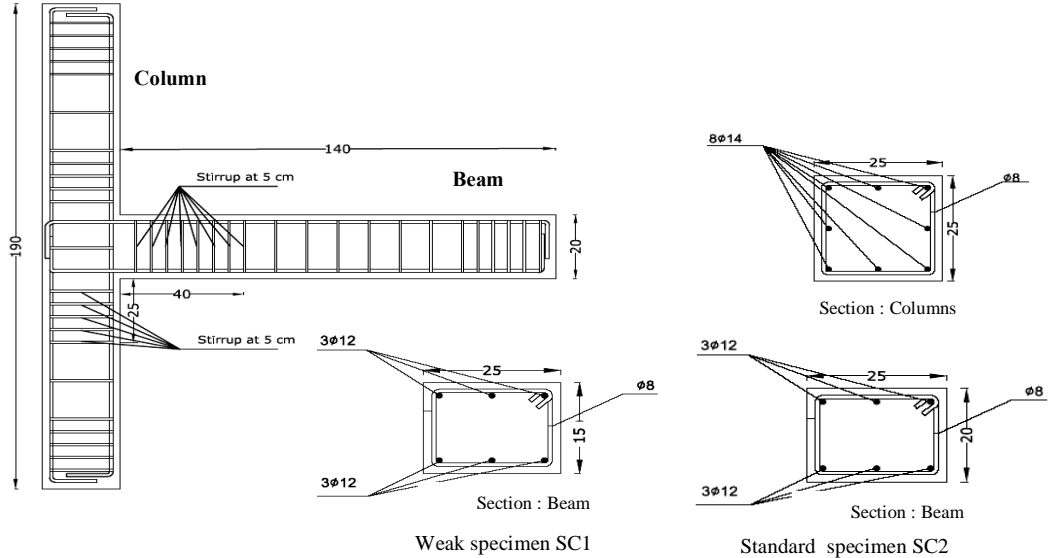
Sections dimensions and arrangement bars of control specimens of SC1&SC2 (in cm)
